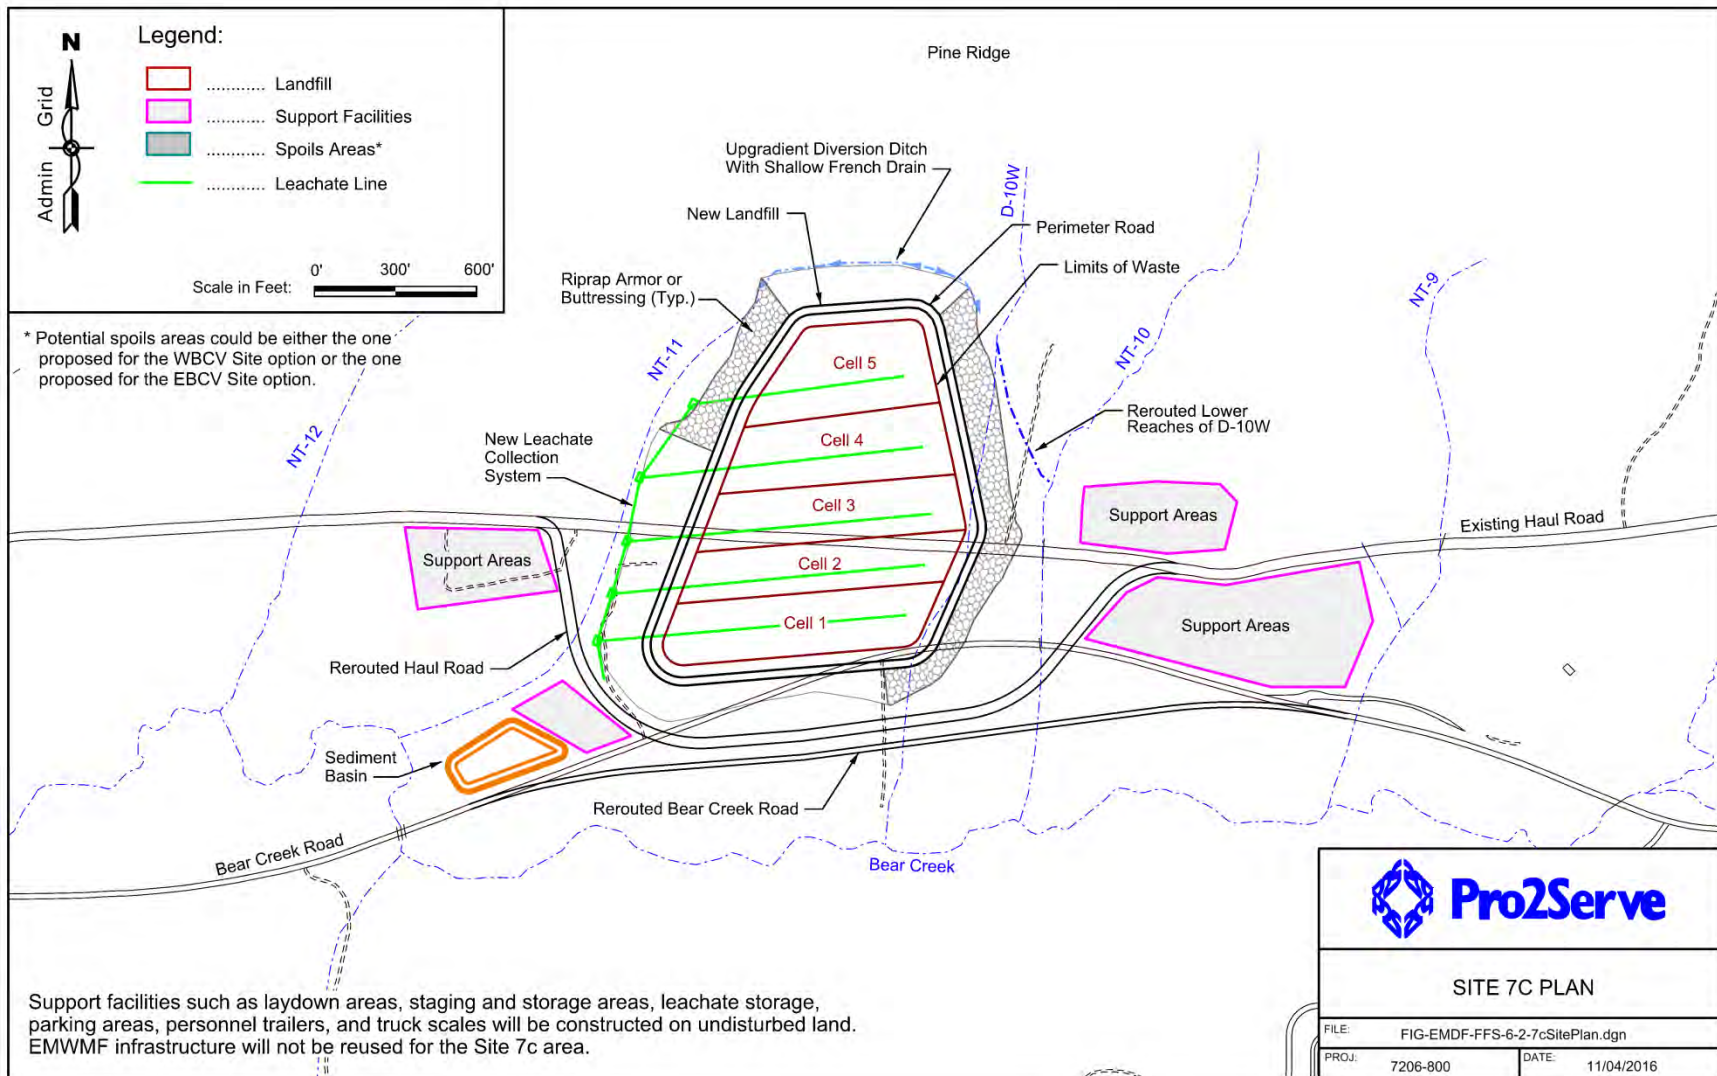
On-site EMDF Conceptual Site Layout Plan at CBCV
